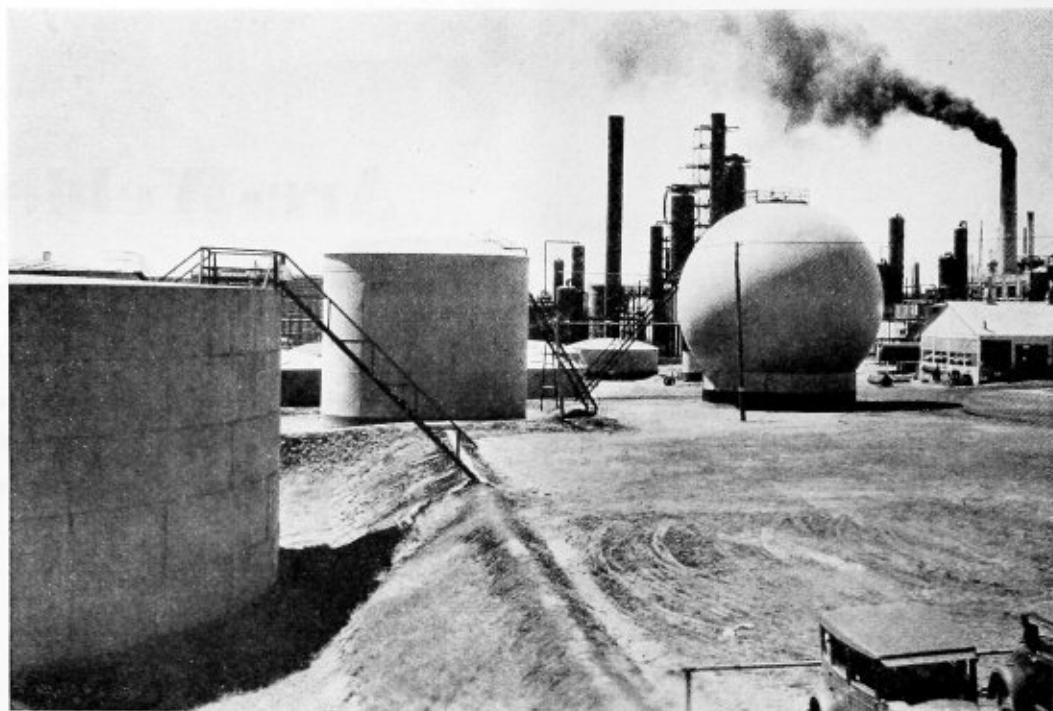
Arc-welded tanks and Hortonsphere
